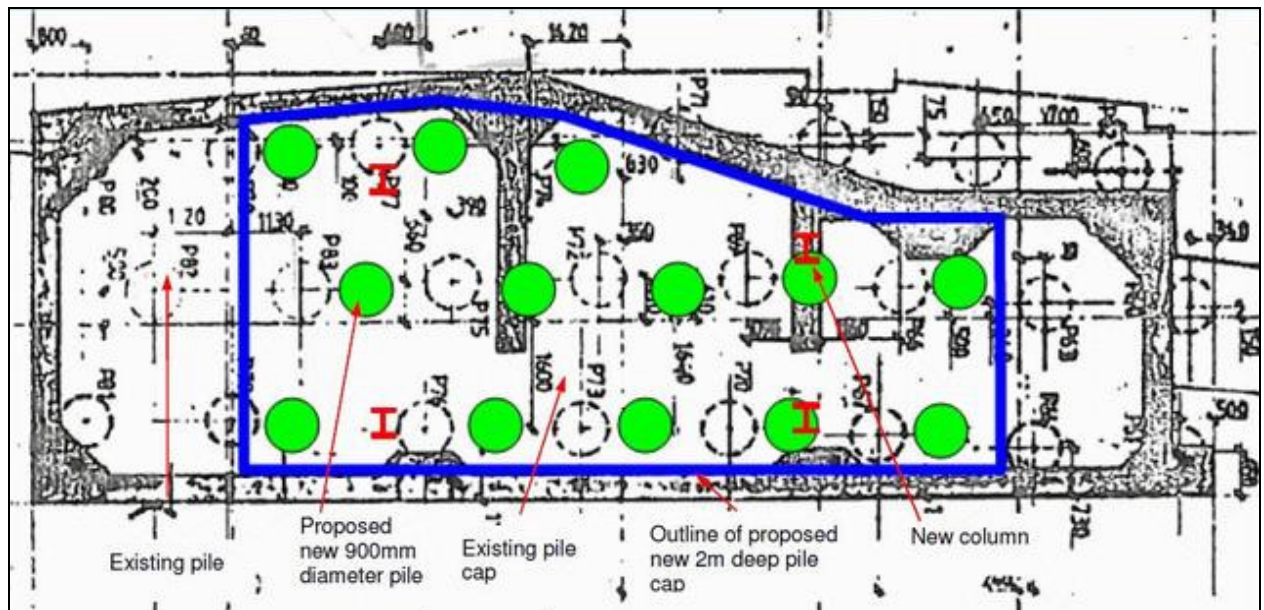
Proposed OSD basement design and pile layout (Mott MacDonald 2011)
